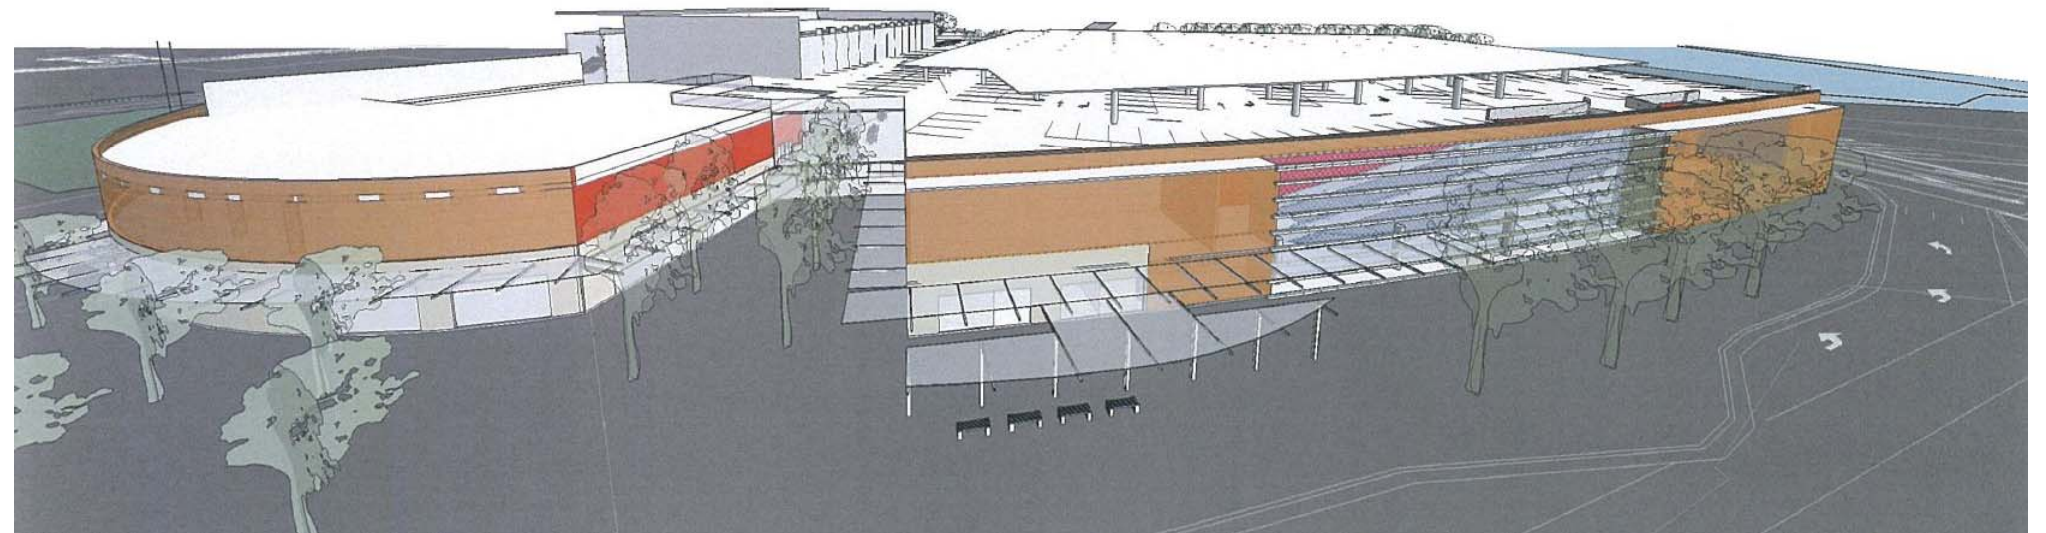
Preliminary design study of Captain Cook Drive elevation exploring façade setback at car park connection ramp.
